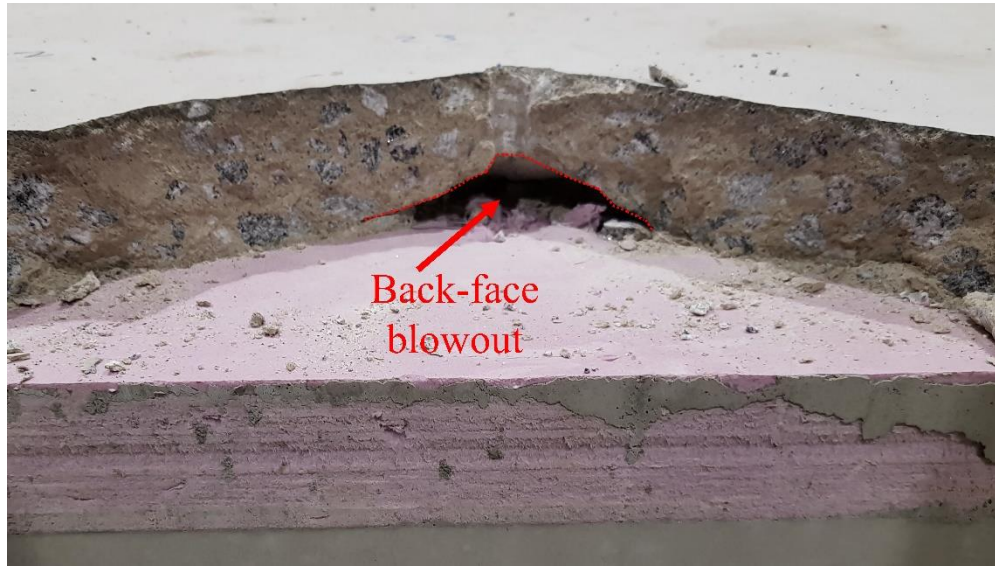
Back-face blowout due to drilling through the concrete layer thickness.
